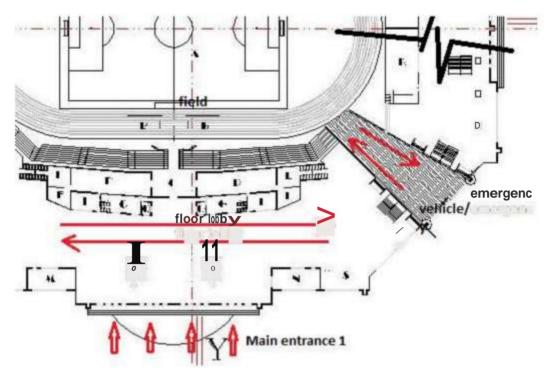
Section of the ground floor plan Source: Author work, 2018
